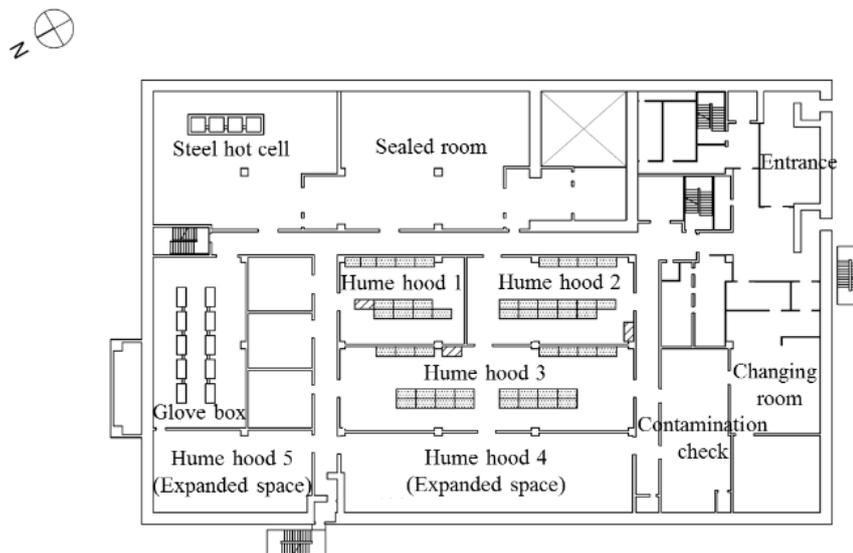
Schematic layout of Laboratory-1 (Second floor plan).
